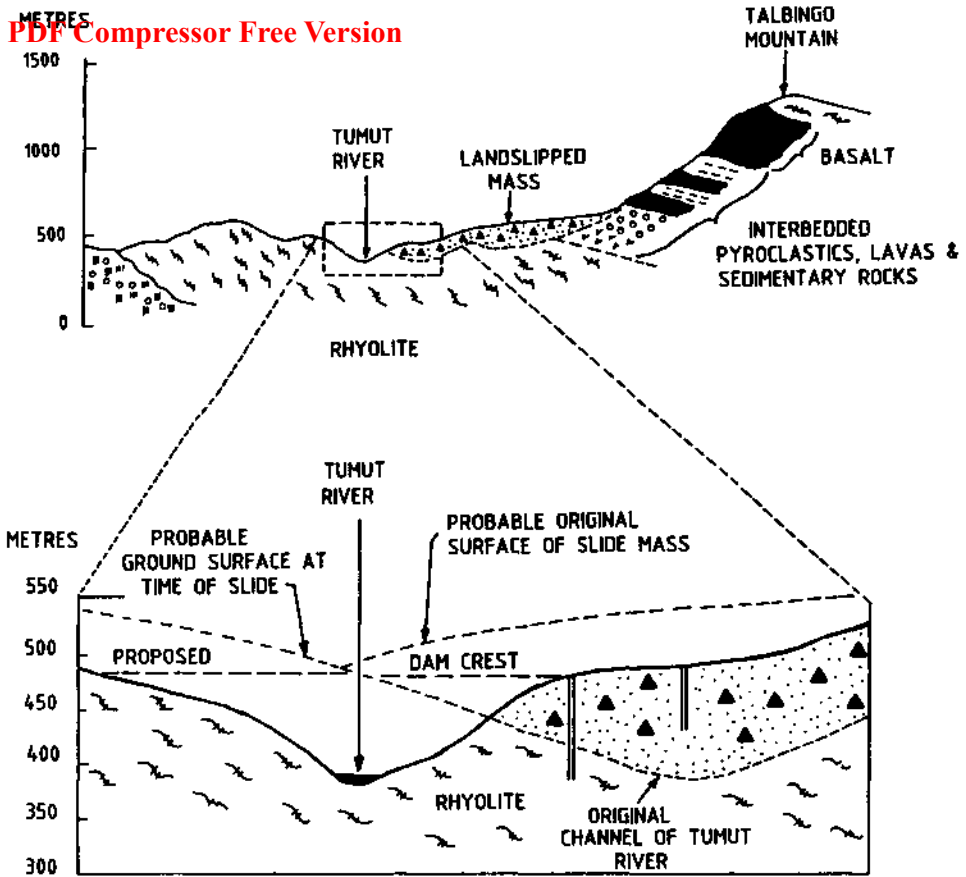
Original site for Talbingo Dam, cross section looking downstream.
